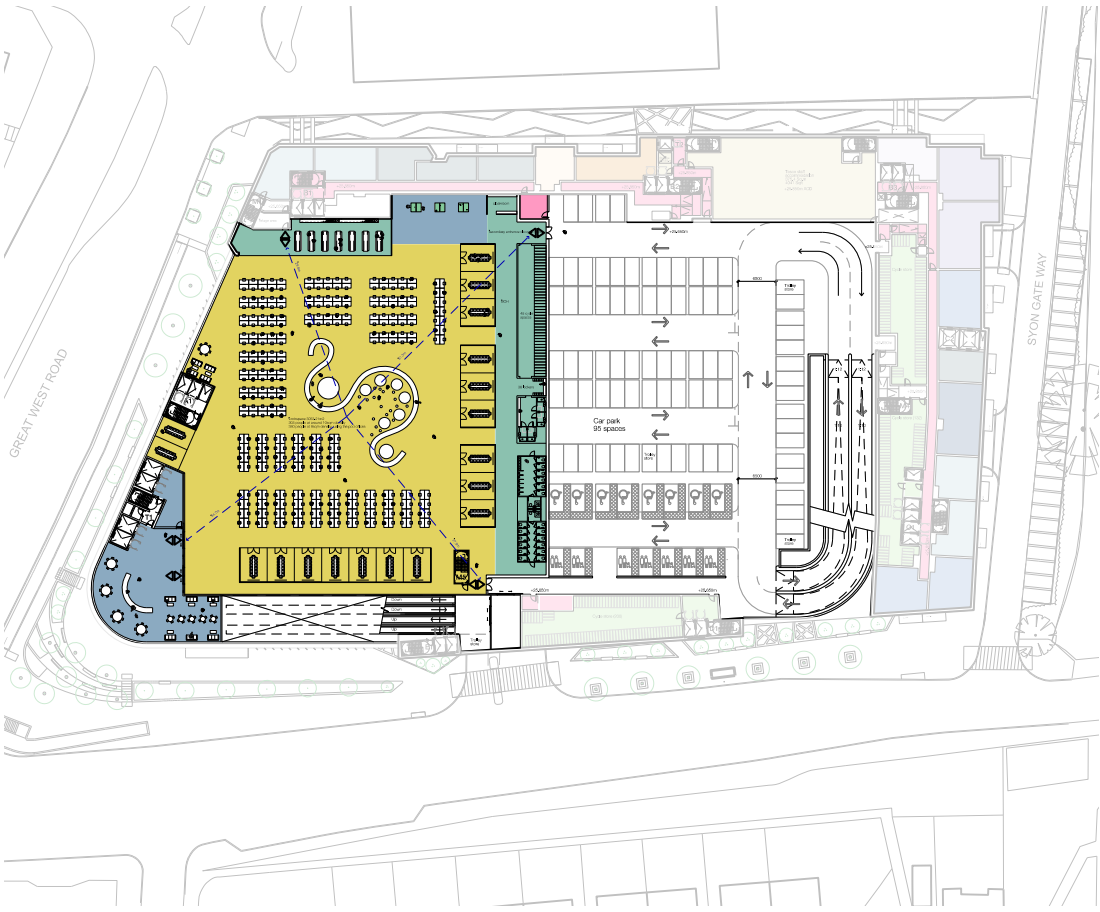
Illustrative layout of alternative office space in car parking levels.
